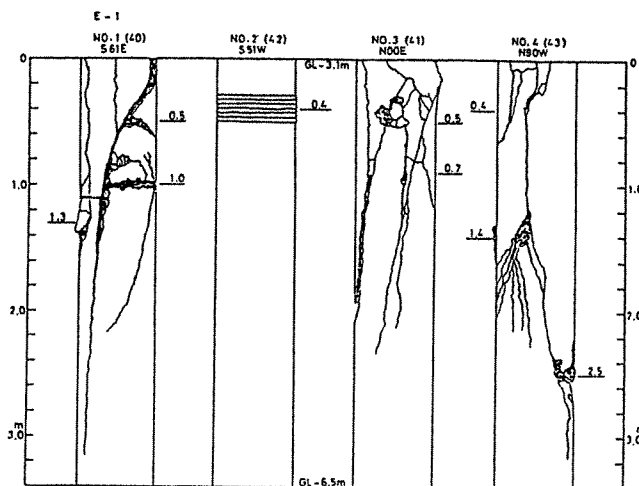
Sketch of damage to piles and a jointed pile with no damage.
